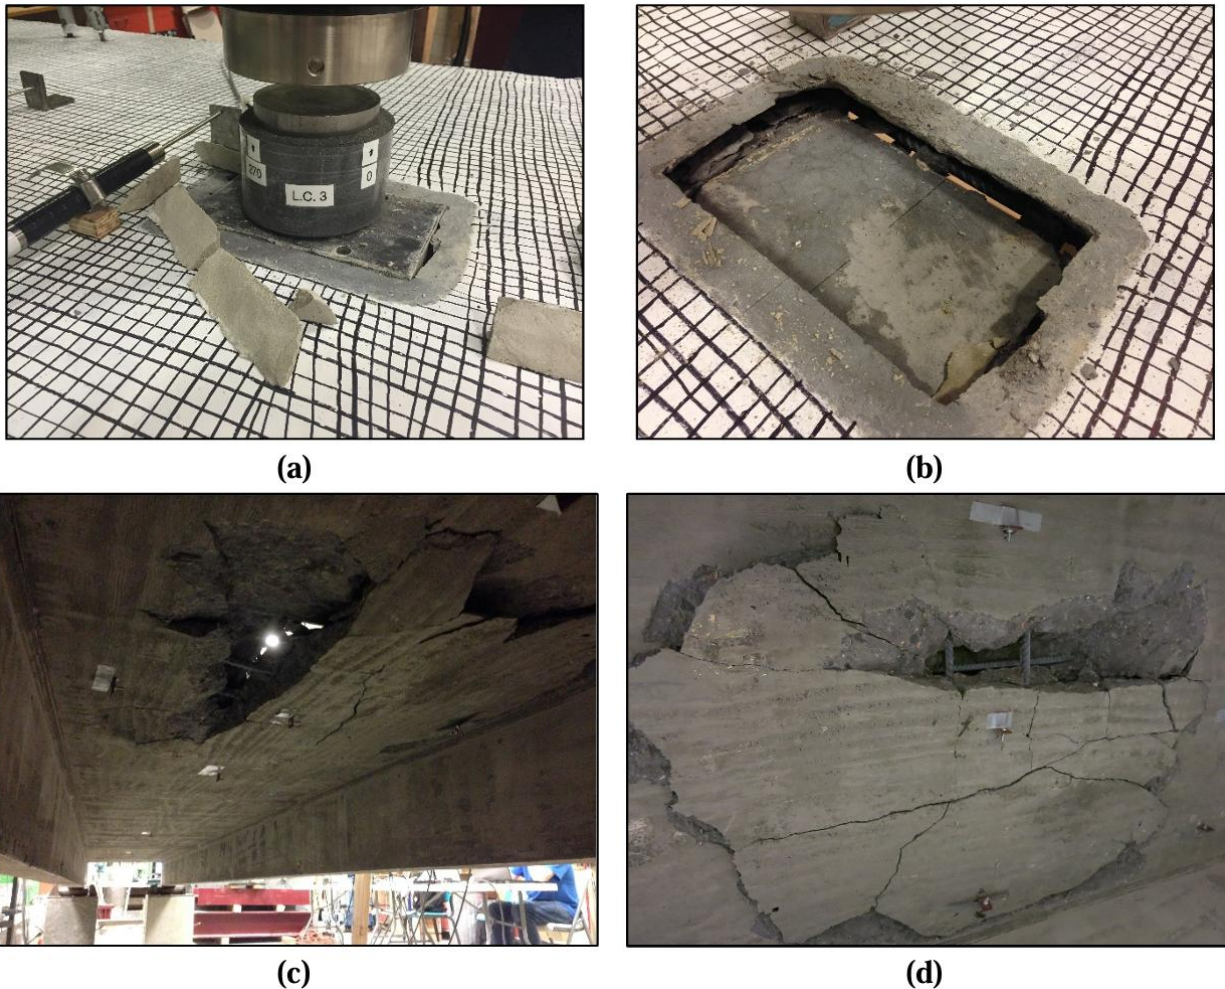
HPC specimen failure due to punching shear - a,b) top of girder; c,d) bottom of girder; (UHPC Phase III, Figure 8.51)
